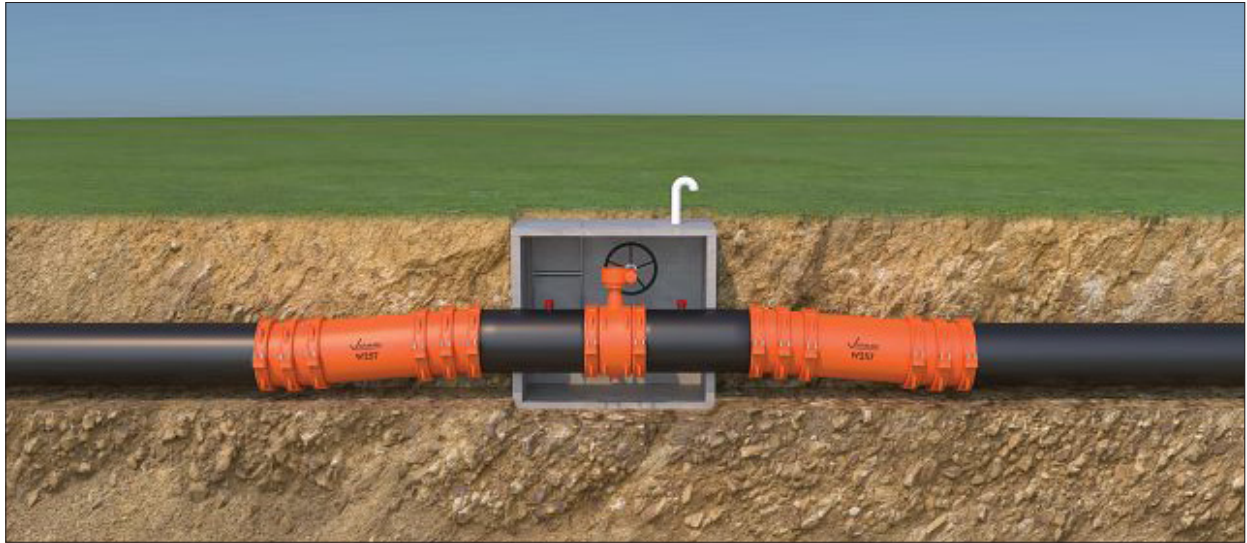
Grooved Flexible Couplings for Settlement and Grooved Valve - Dismantling Joint Not Required
